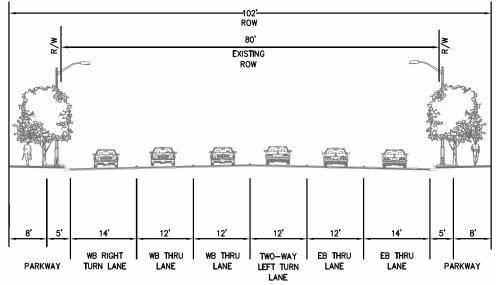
Proposed Cross Section, E Street Between I-5 and 300' East of I-5 N Ramp
